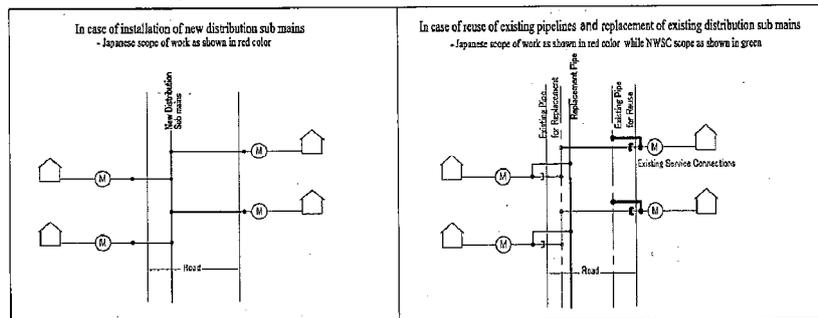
Distribution Main Construction and Connecting to Existing Distribution Submain
